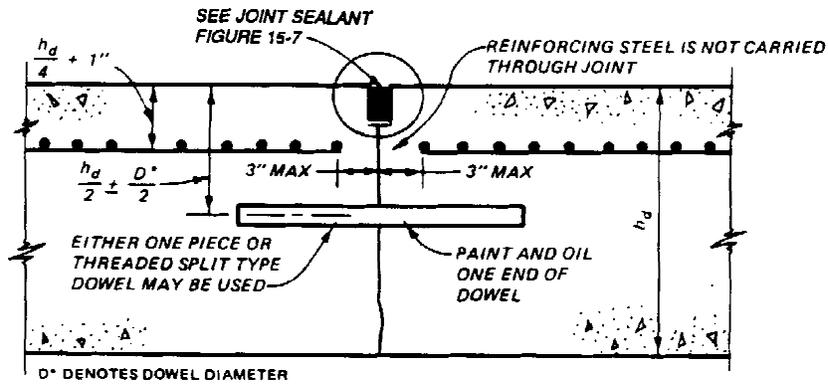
through 16-3 present details of the contraction, construction, and expansion joints in reinforced concrete pavements. Joint requirements
